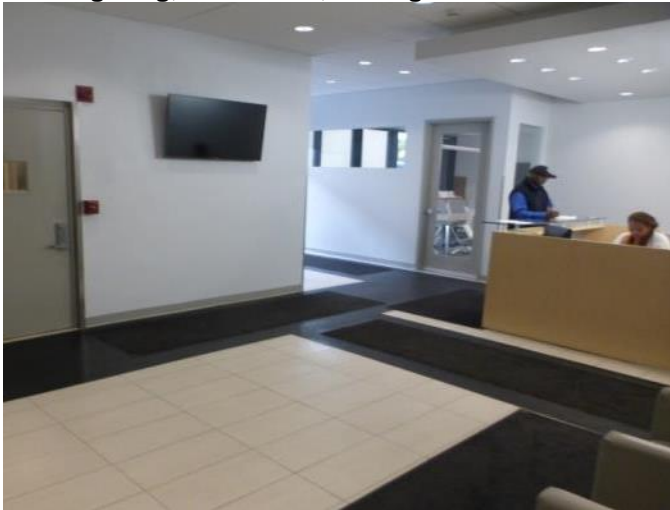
Facility Upgrades - New Concrete Slab at Facility Entrance
